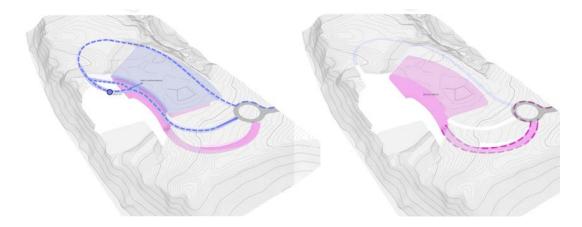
Visitor/Staff Parking (Blue) & Service Parking (Pink) (Source: Author)
